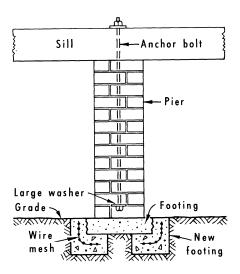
A method of increasing the width of an existing footing. The load on the pier must be relieved until the new footing has hardened.
